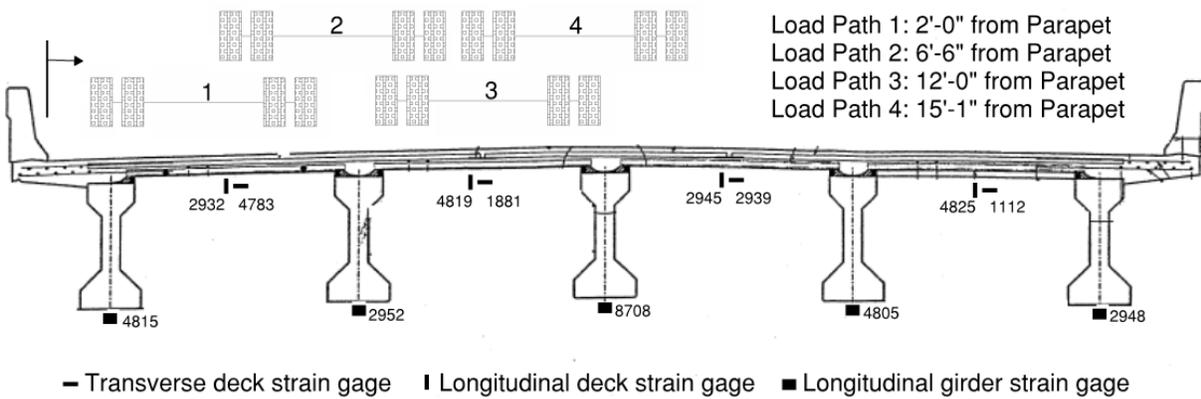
US 151 northbound over STH 26 Service Road load path and gage locations - looking west
